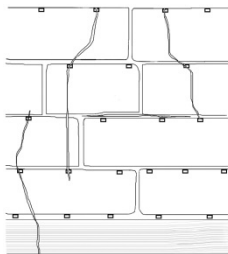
Drawing illustrating the pattern of cracks observed on the walls of the stabilized rammed earth houses in Mostefa Ben Brahim
